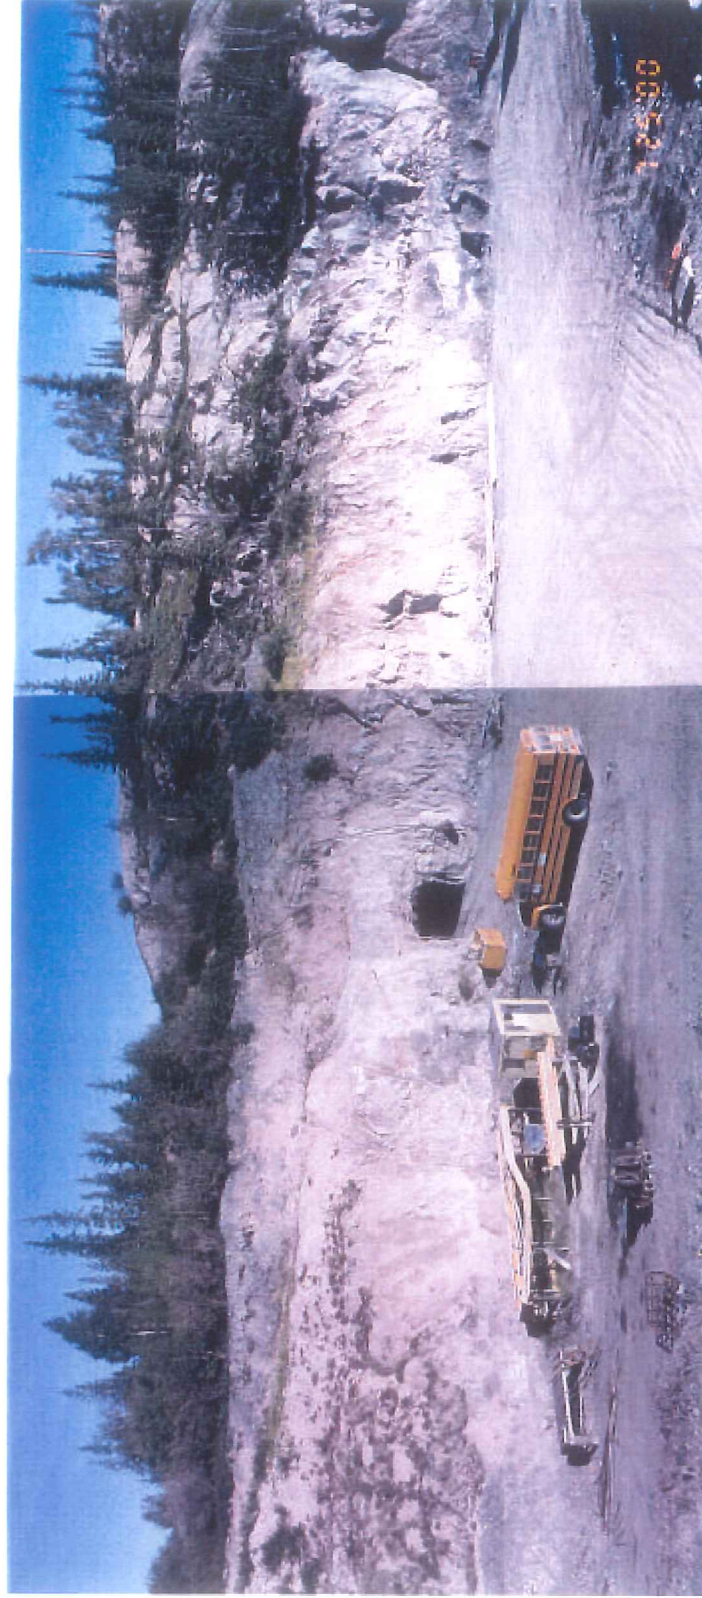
West side of B-3 Pit. Access to underground in center of photo.
